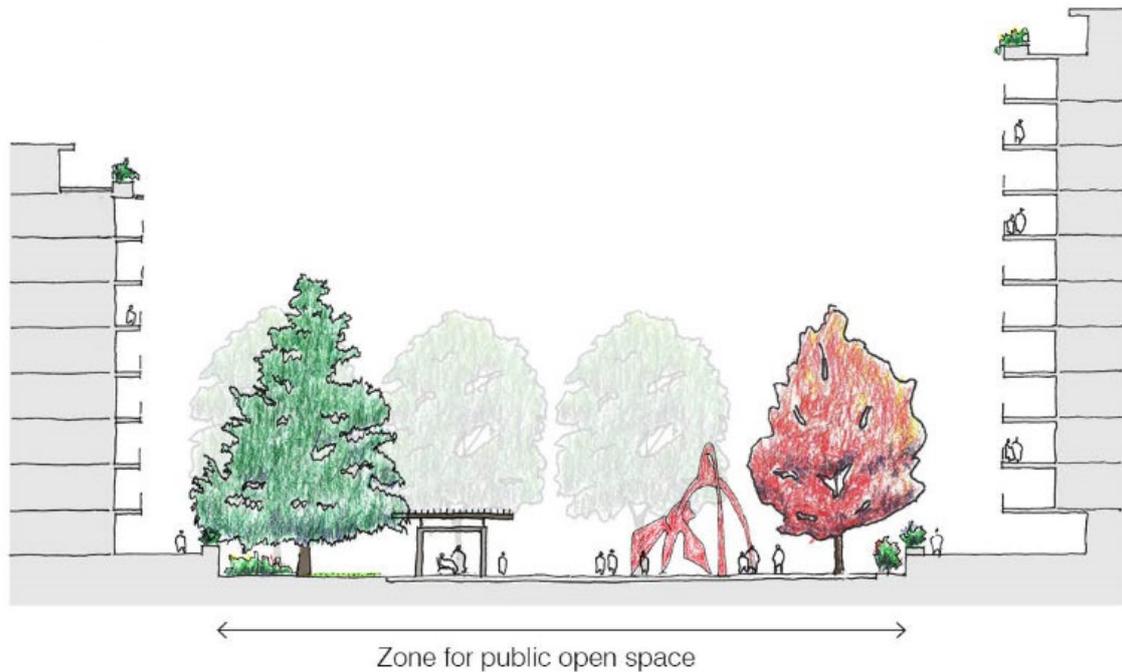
Illustrative Indicative Landscape Masterplan: Northern Finger Linear Park with Station Street Plaza. (Detailed Design subject to Landscape Competition)
